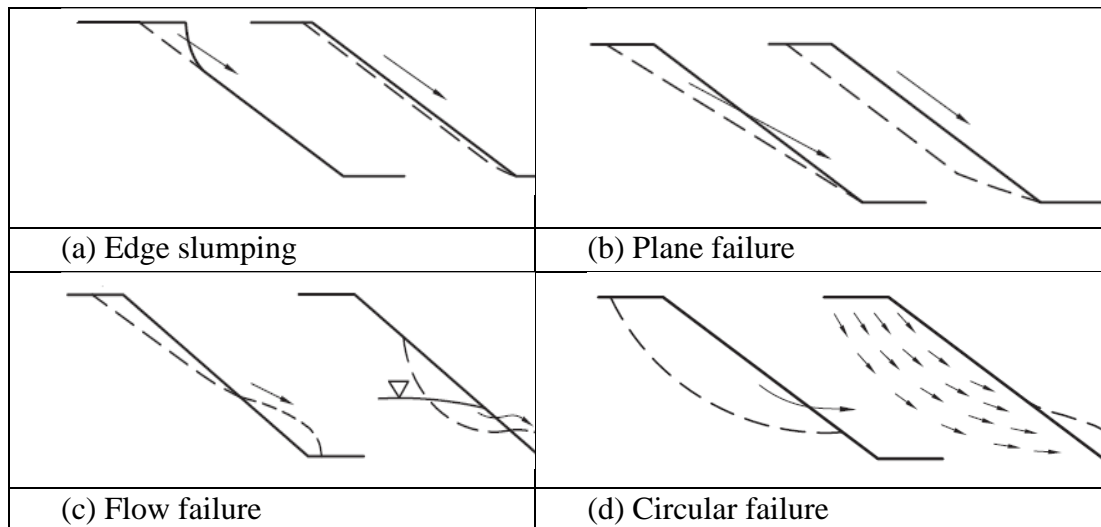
4 Profile of the dump after failure (a) Edge slumping (b) Plane failure (c) Flow failure (d) Circular failure
